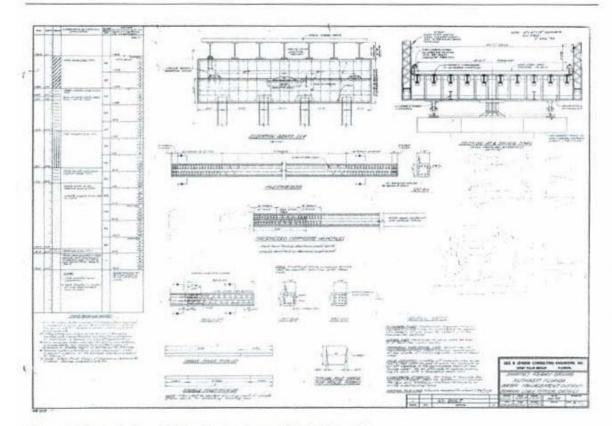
Sharpe's Ferry Bridge Boring Log and Typical Details
